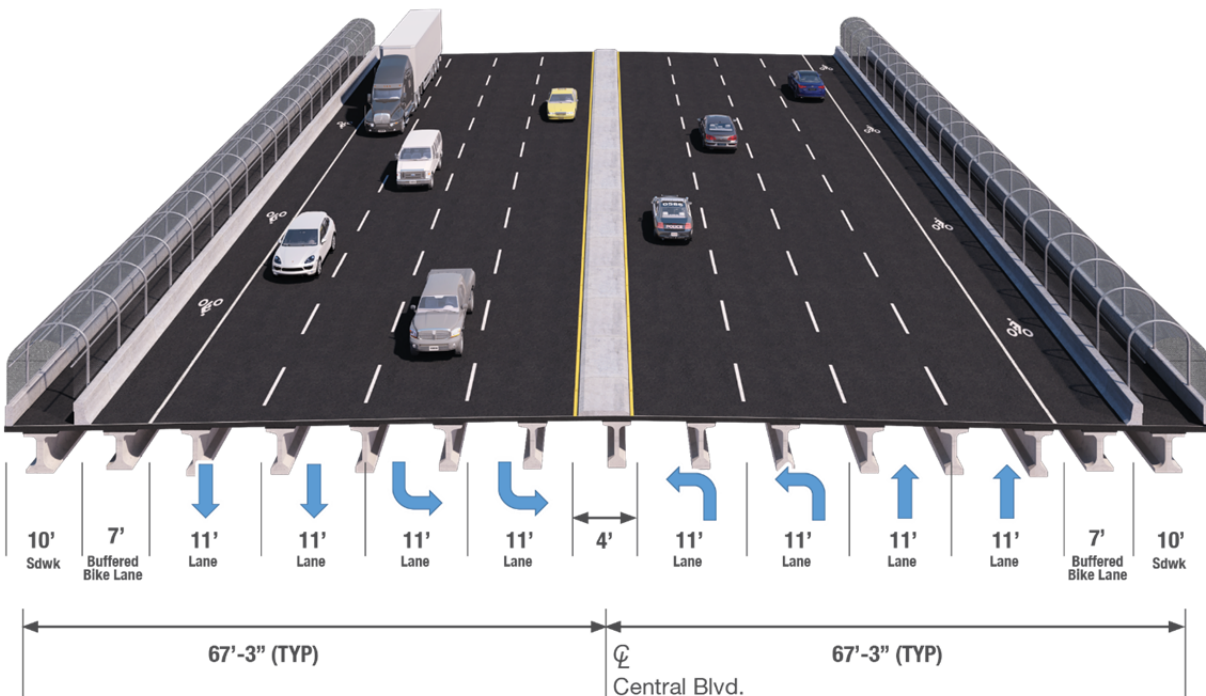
Proposed Typical Section - Central Blvd. East of I-95 – TDUI
